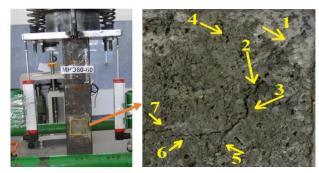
Concrete (mortar) cracking in CFST column having horizontal deficiency
